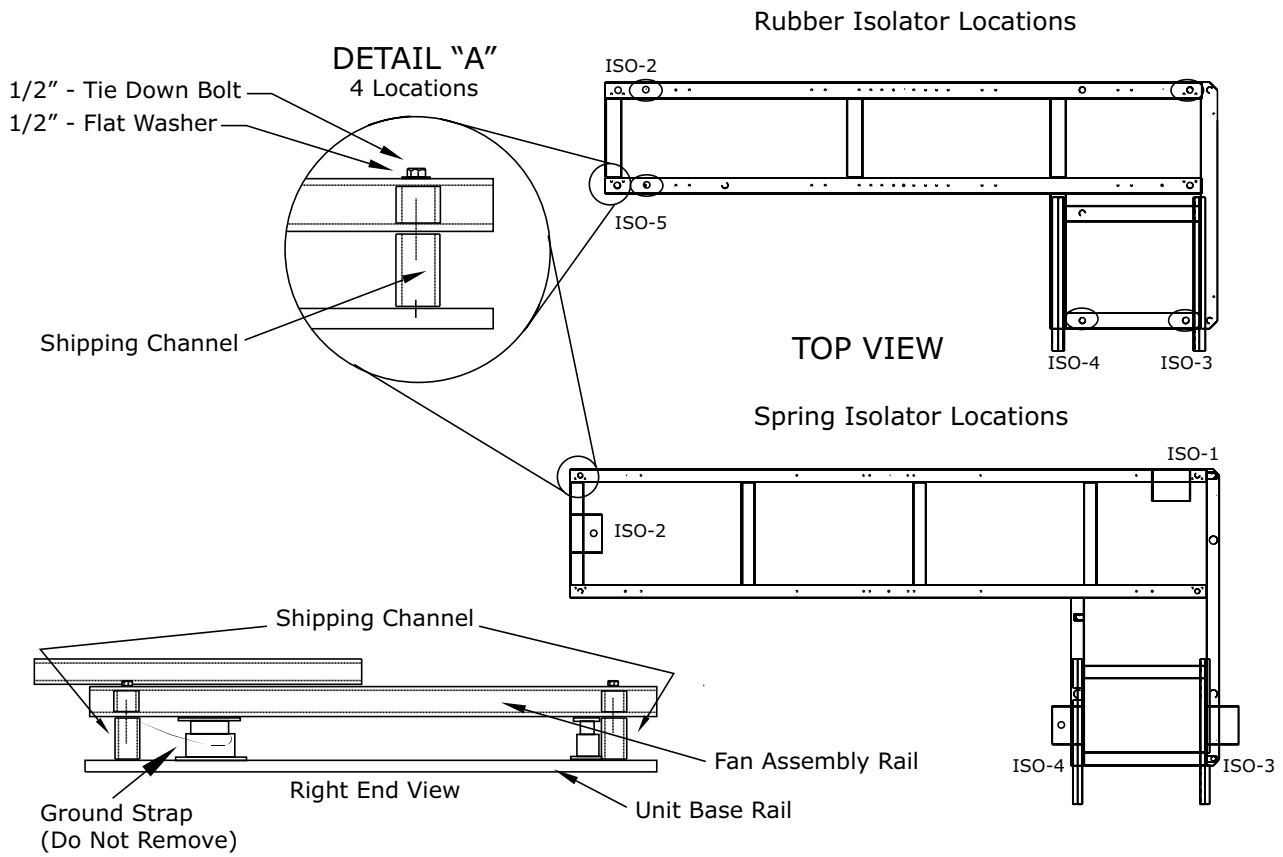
Removing supply and relief fan assembly shipping hardware (90 to 130 ton)
